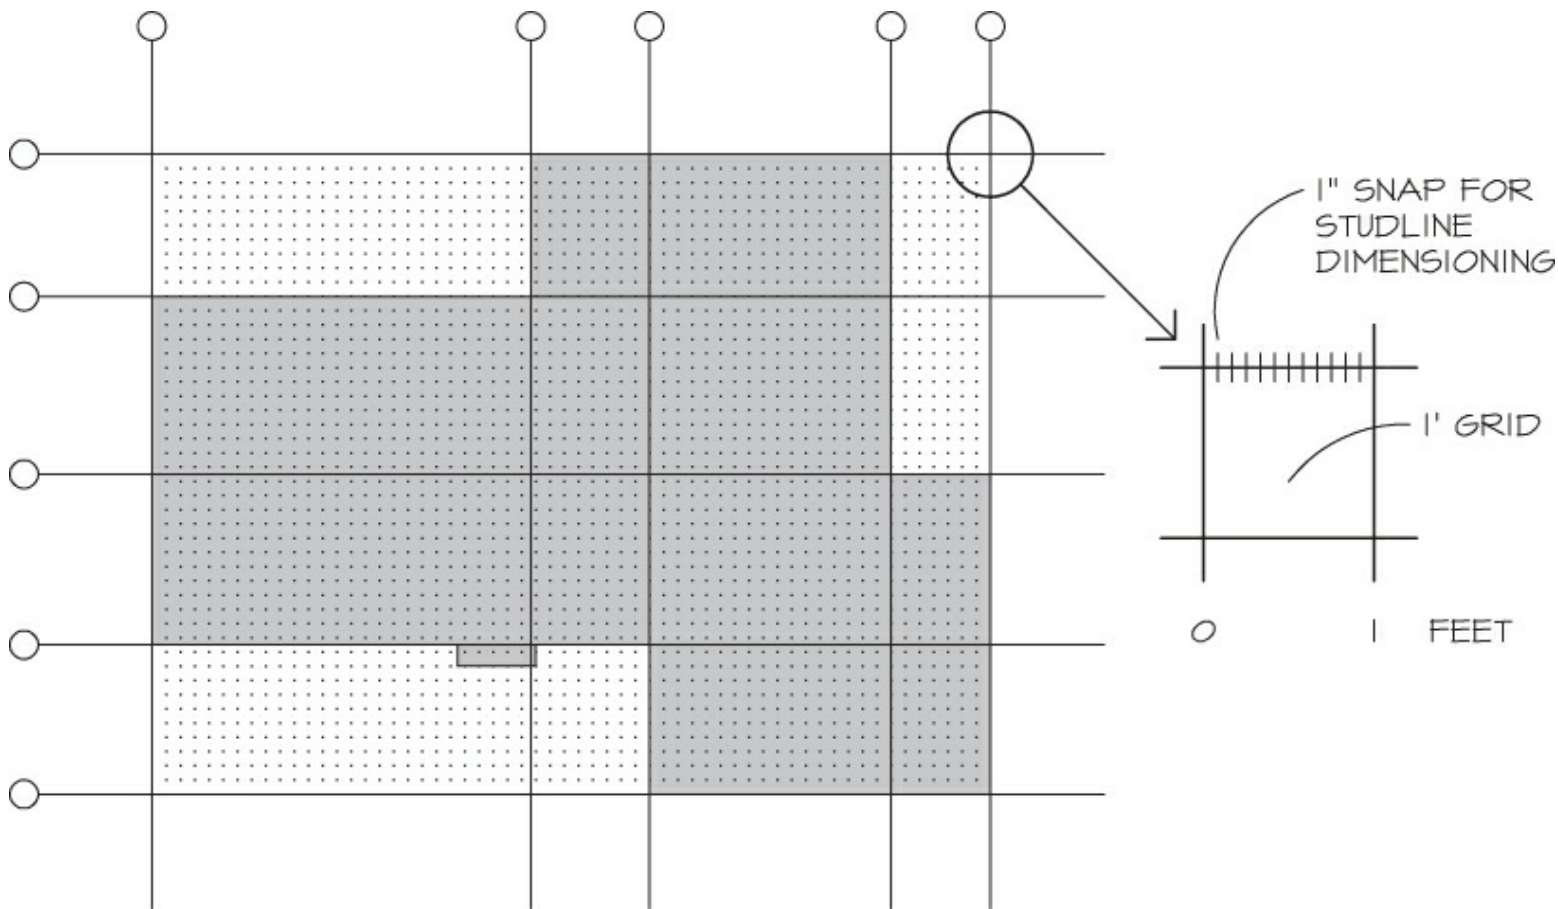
Pictorial and preliminary floor...plan layout.
